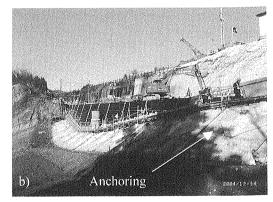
Collapsed embankment along JR Joetsu line and its reconstruction (between Echigo-Kawaguchi and Ojiya stations; at Aikawa, Kawaguchi-machi; site 2 in Figure 1)
